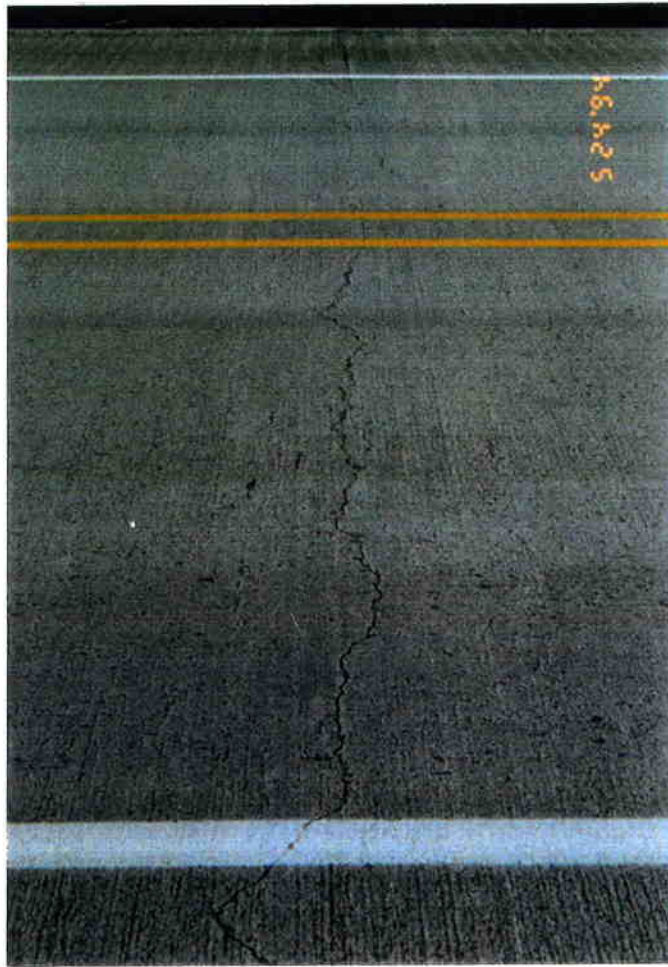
Transverse Cracks on Deck Surface at Bent 8
